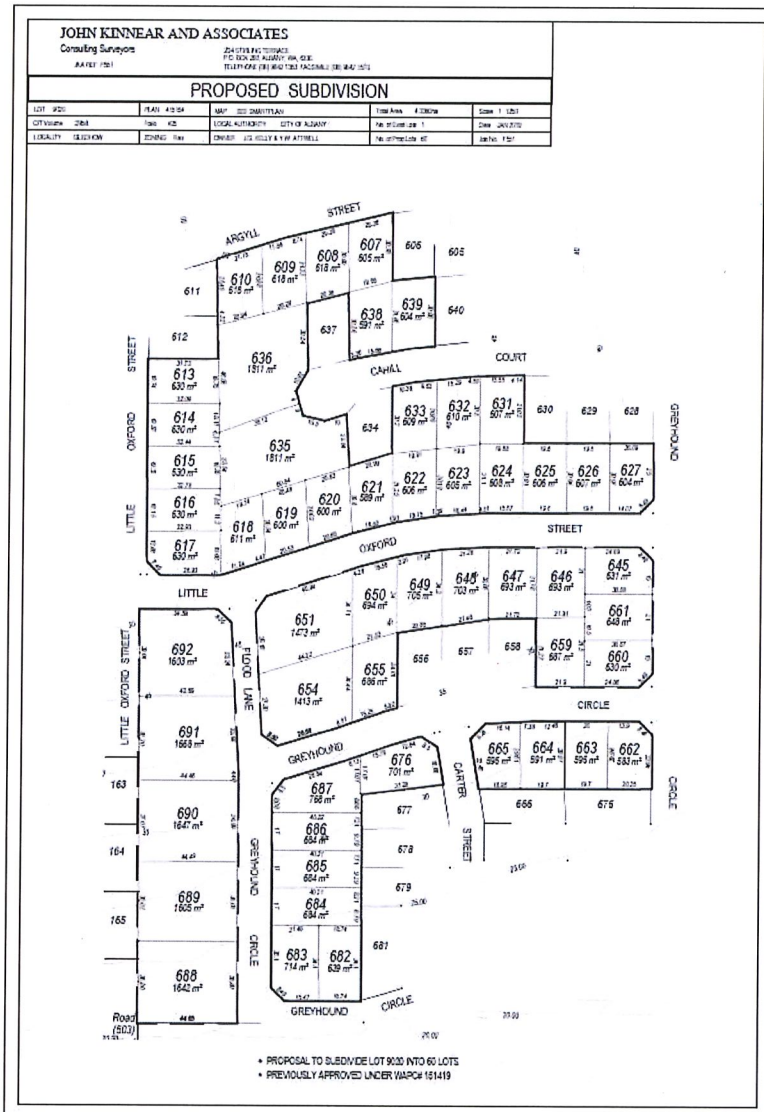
Plan of subdivision (Local Development Plan September 2019)
